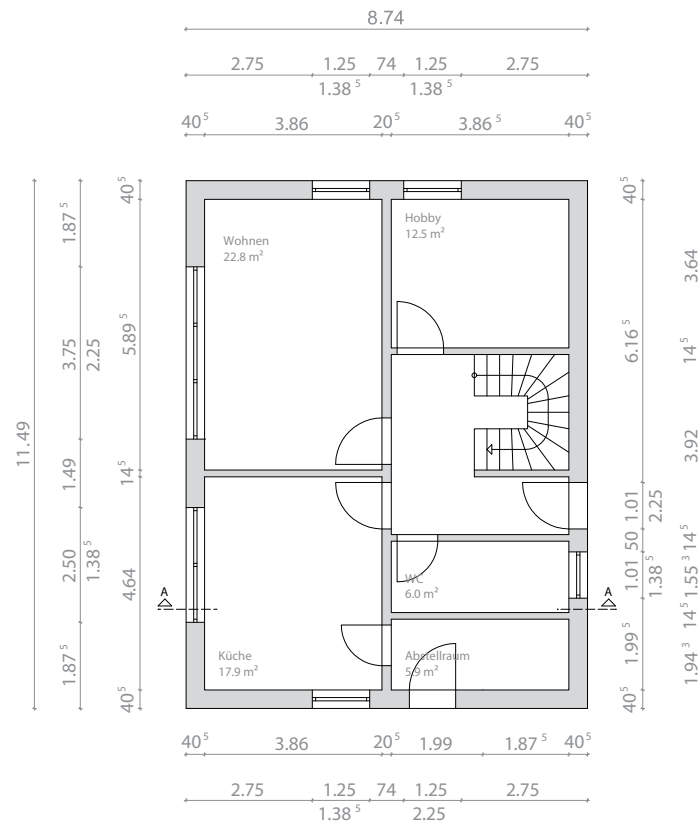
Plan of the ground floor of the modeled building (Constantin et al., 2014).
